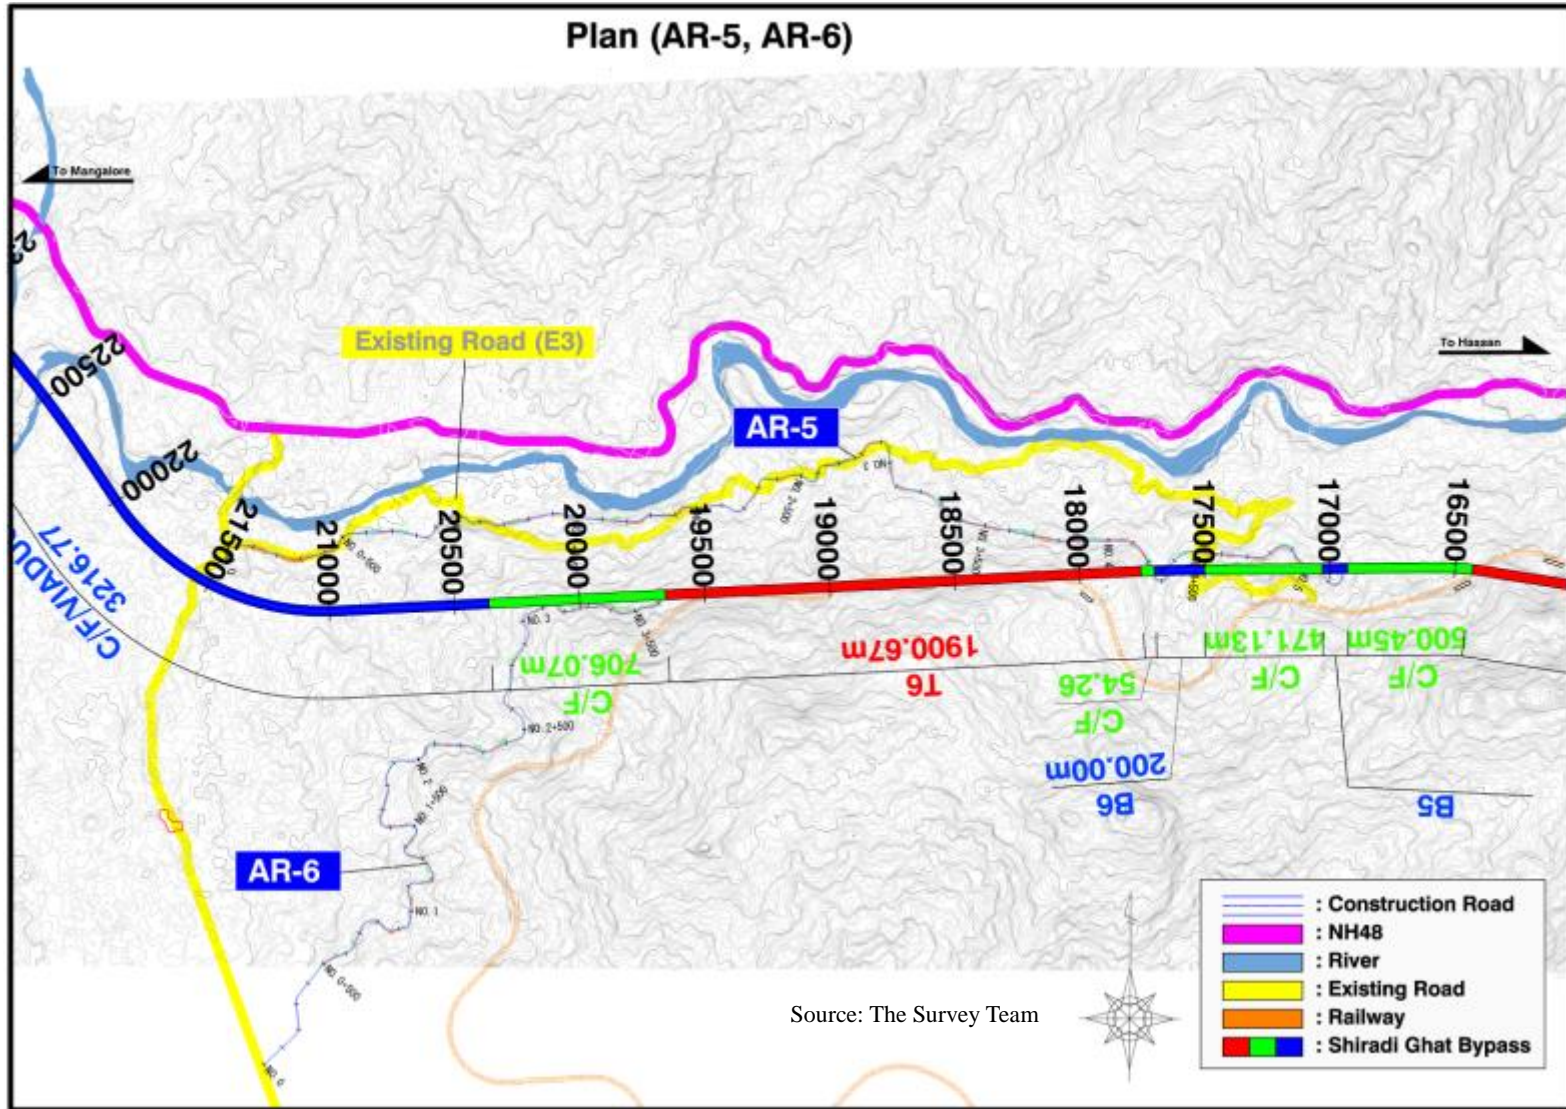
Plan of Construction Road (AR-1, AR-6)
